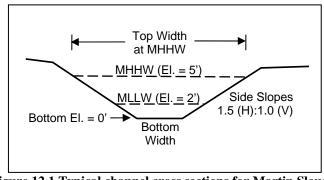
Typical channel cross sections for Martin Slough. Top and bottom width varies with location.
